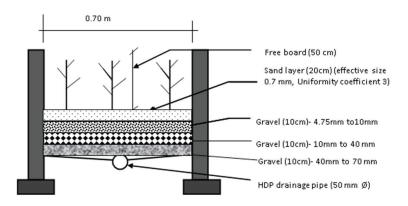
Cross sectional view of pilot scale sludge drying reed bed.
